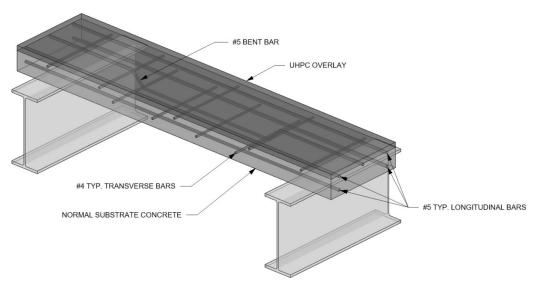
Test Slab Isometric View (with an example UHPC overlay shown).
